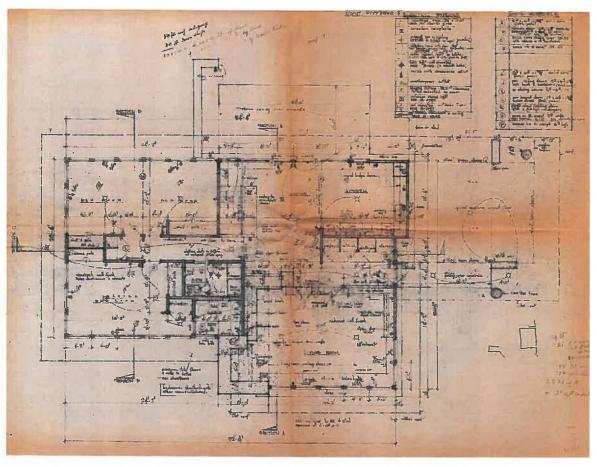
Blueprint for the Hammond House, first floor layout, ca. 1962.
